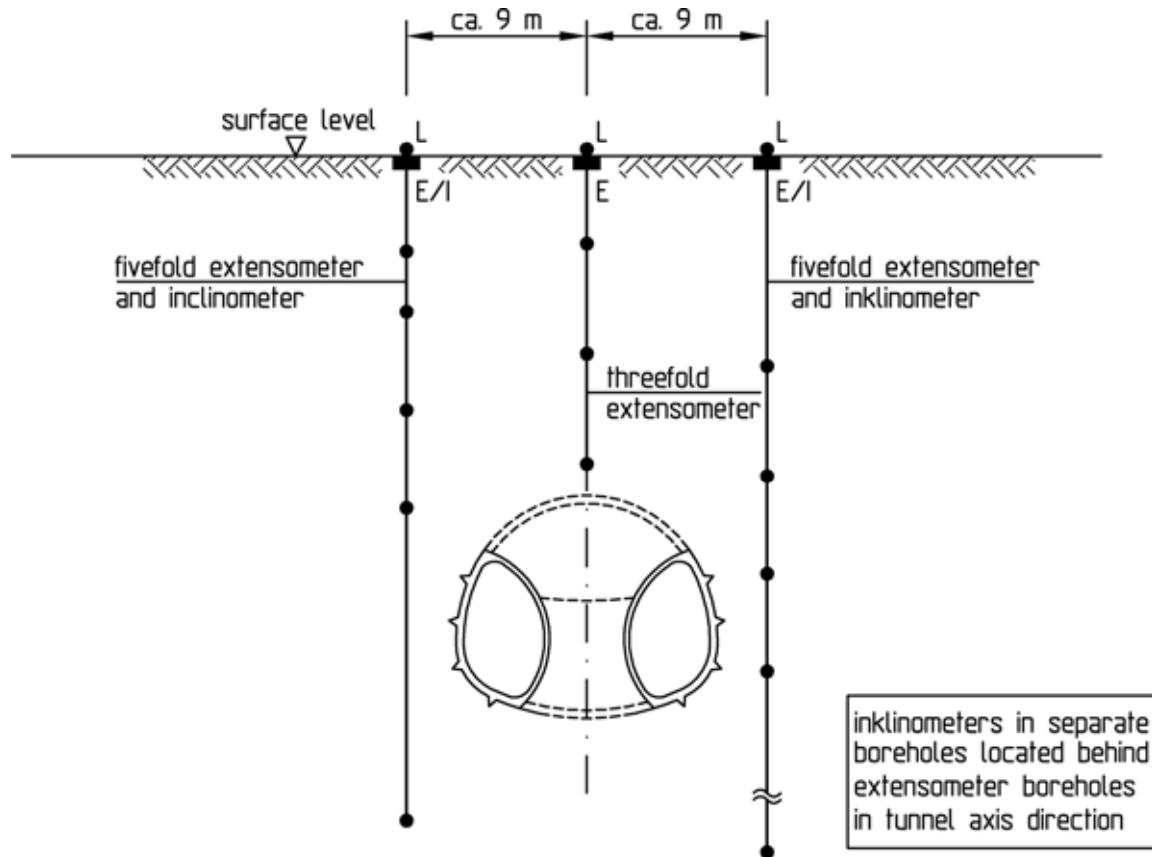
Measuring cross-section with extensometers and inclinometers (constructed from the ground surface)
